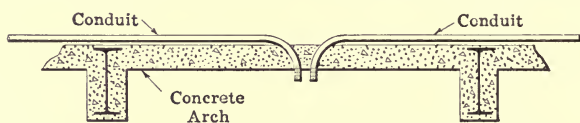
CORRECT INSTALLATION OF BENT CONDUIT.
